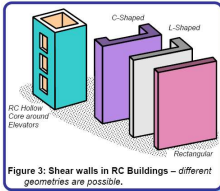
Shear walls in RC Buildings – different geometries are possible.
